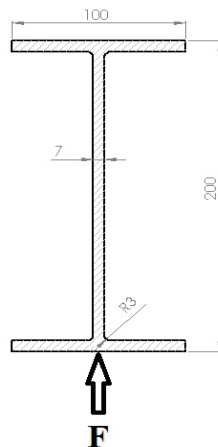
Crane’s girder cross-section, where: F is tested plane.
